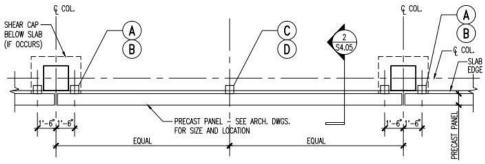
Precast Plan Detail - by Cagley and Assoc.
